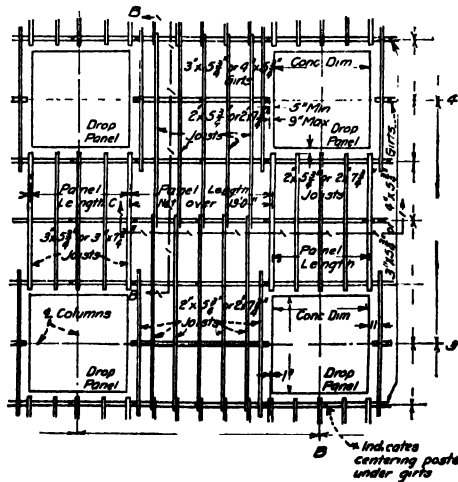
Assembly plan for interior bay—flat slab floor.
